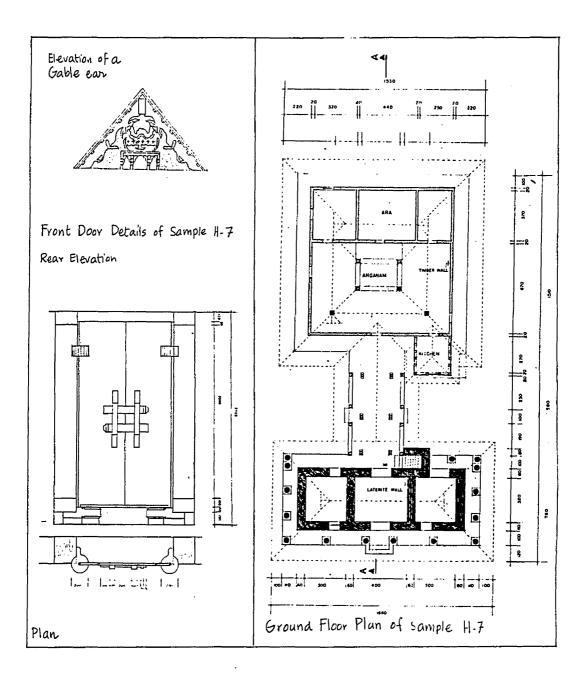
Plan, elevations, section and gable details of sample H7(After: Kerala State Nirmithi Kendra, Documentation of traditional houses in Kerala, 1993).
